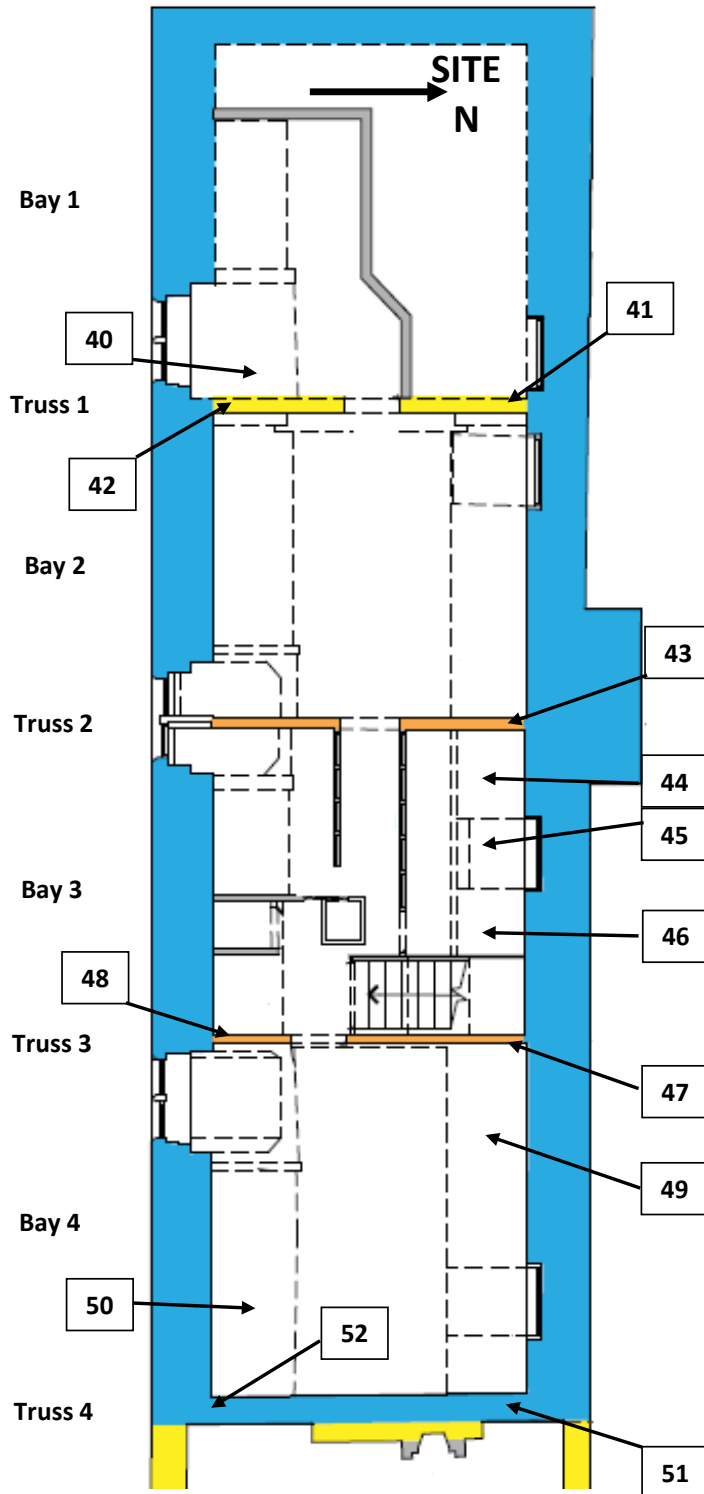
Second-floor plan of the kitchen/service range to located sample timbers (after Worcestershire Archaeology 2019)
